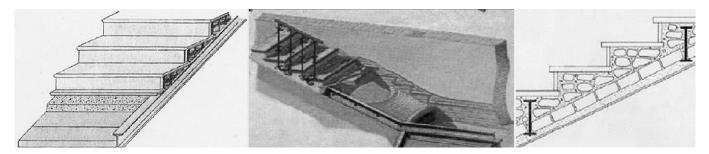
Examples of mixed brick/iron staircases: from the left, iron beams parallel to the flight and flat brick blocks [16]; iron beams parallel to the flight and vaulted brick blocks [16]; iron beams perpendicular to the flight [14].
